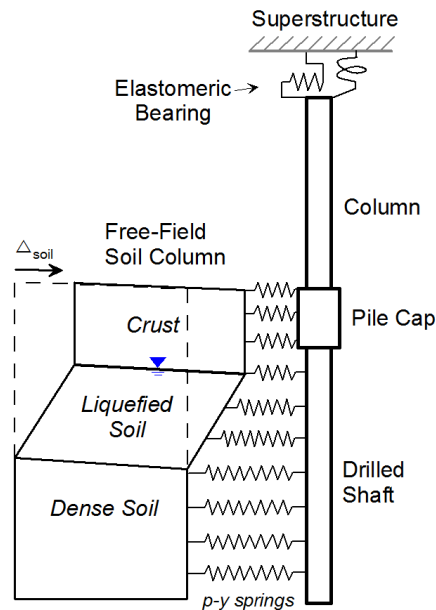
Simplified numerical model of lateral spreading acting on highway bridge extended-shaft column/foundation. Refer to Table 1 for soil profile details.
